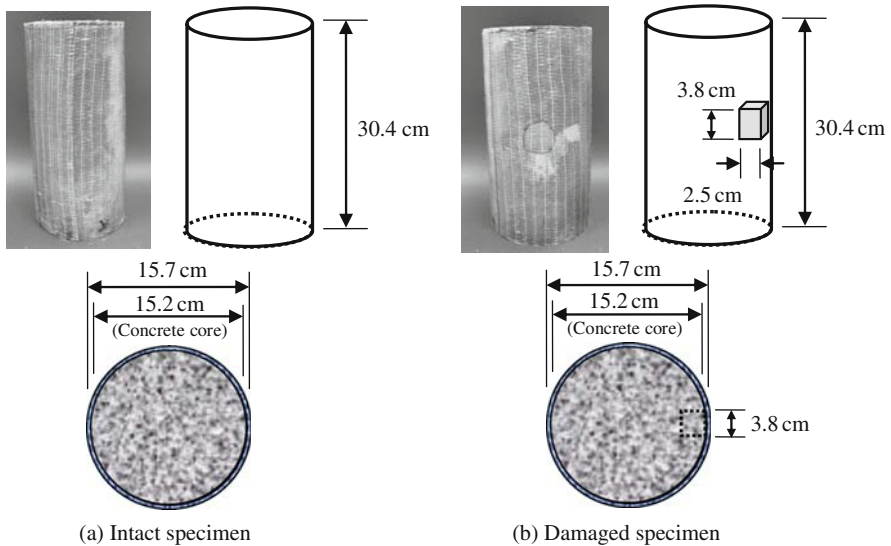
Intact and damaged GFRP-wrapped concrete cylinder specimens
